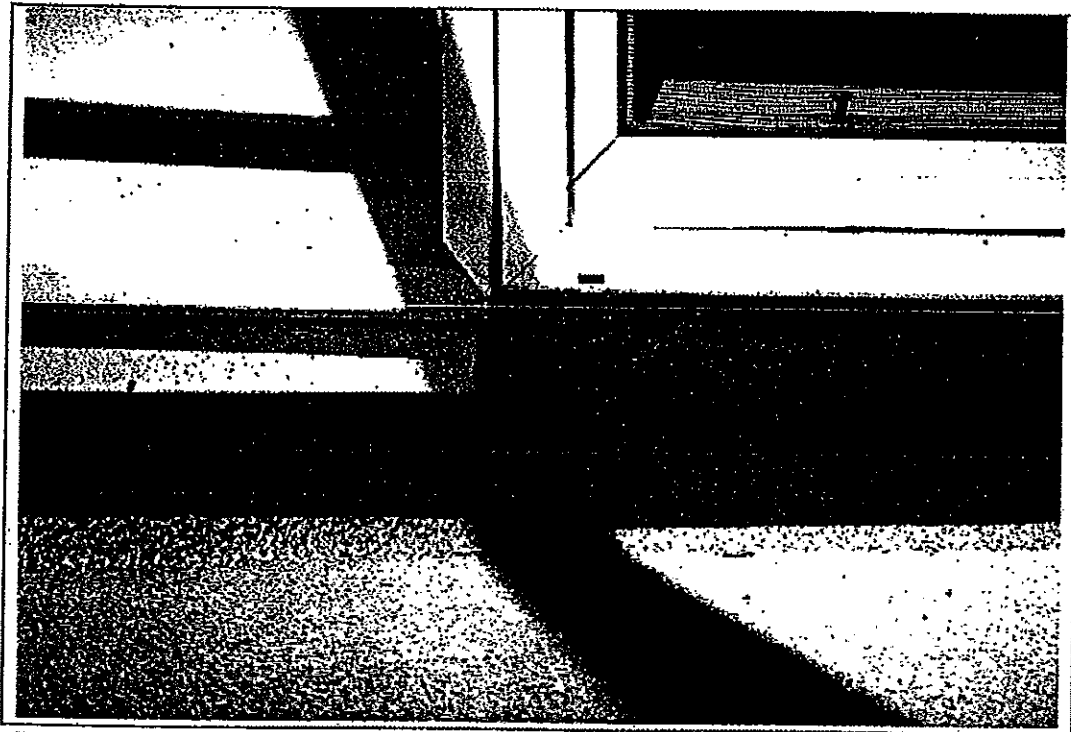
Termination of vinyl balcony membrane below a balcony door. The membrane did not appear to extend onto the top of the doorsill framing.
